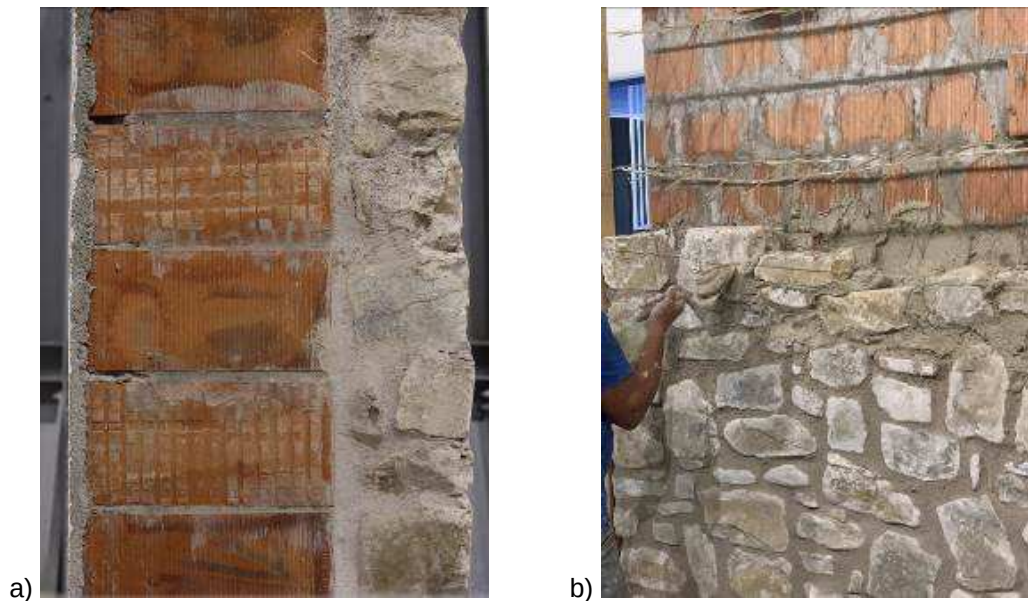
The new technology of fair-face double leaf masonry: a) section view, b) detail of the front face and stone laying.
